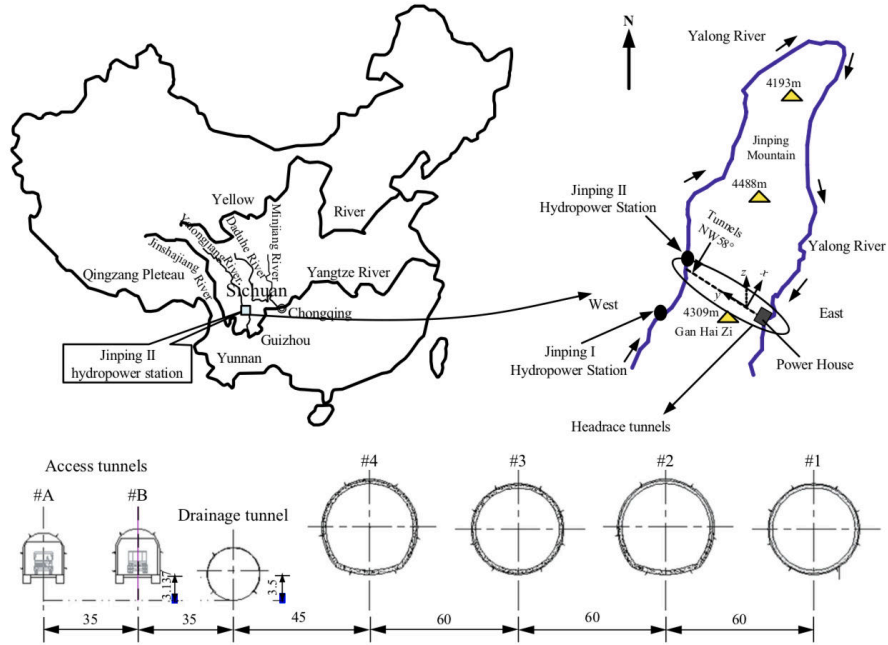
Location and layout of 7 tunnels in the Jinping mountain [85].
